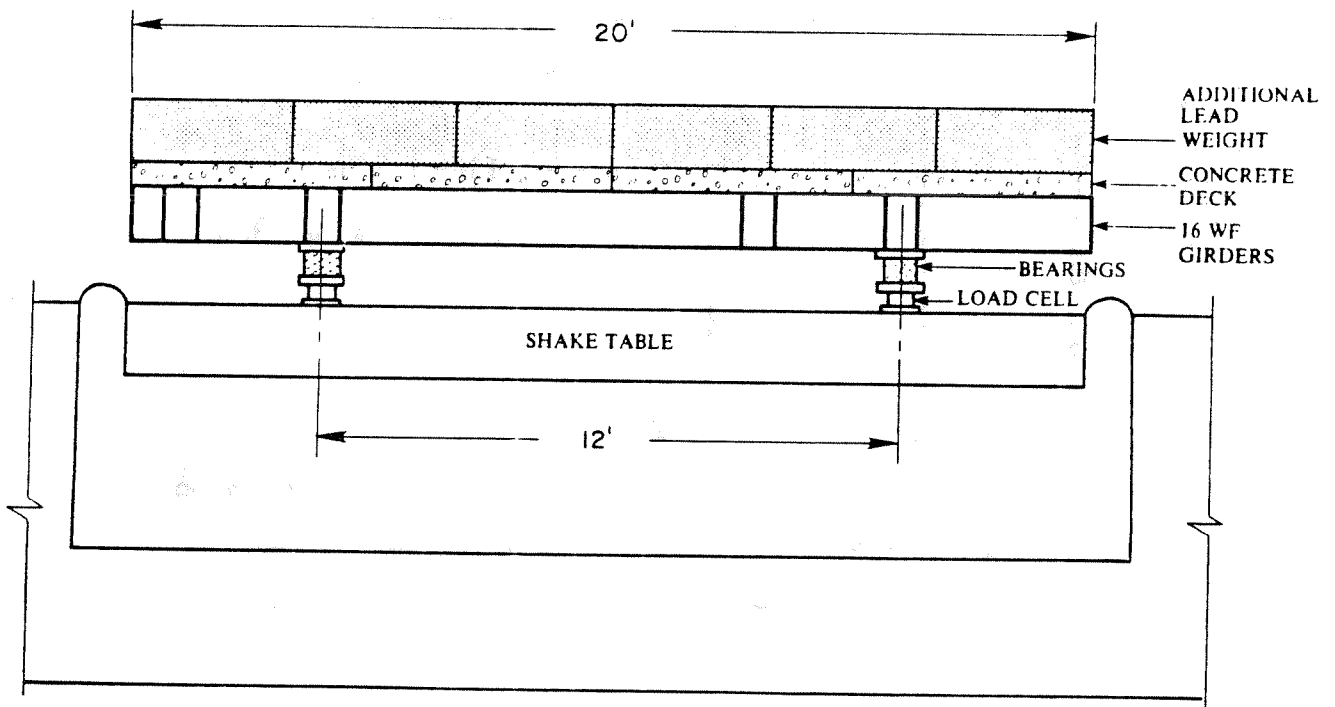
Longitudinal elevation of base-isolated bridge deck in shaking table tests
